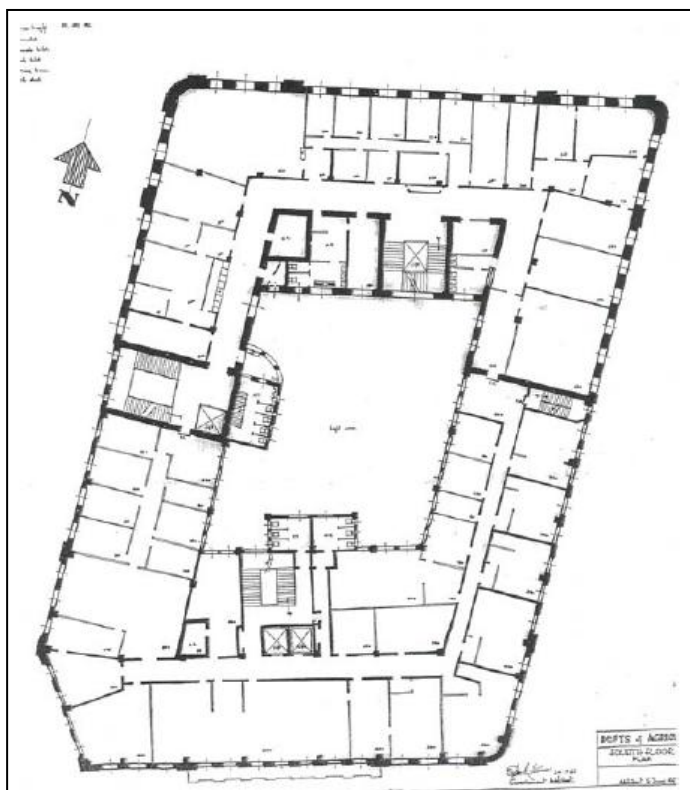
“Fourth and Fifth Floor Plan, Departments of Agriculture and Education” 1963. This plan graphically illustrates the differences between the two phases of construction. Note the thicker external walls and the two structural masonry cores in the 1915 building at the top.
